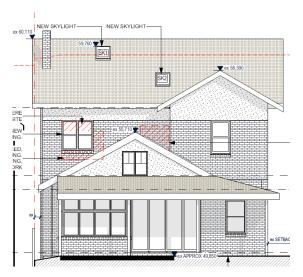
Proposed south-eastern elevation - 71 Darley Road, Randwick (Source: Pamment Projects).
